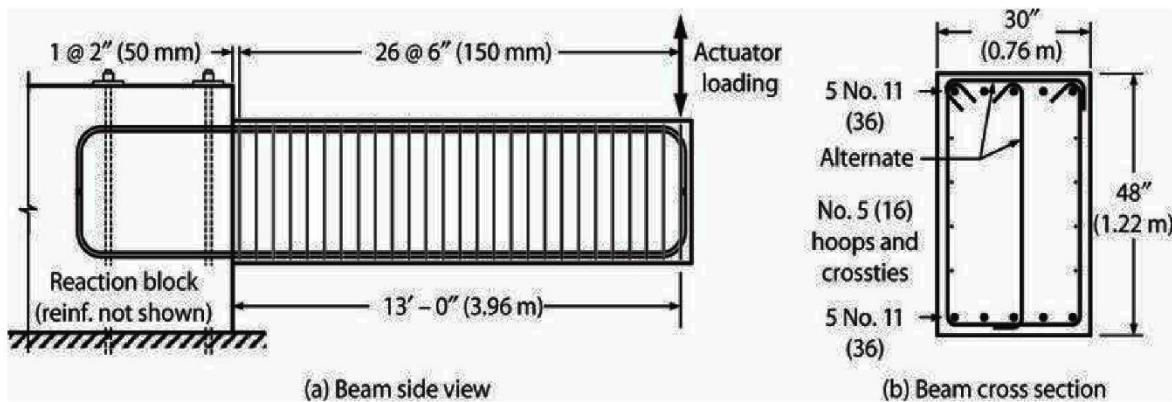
(a) Laboratory test beam. (b) Beam cross section. (After Panagiotou et al., 2013.)
